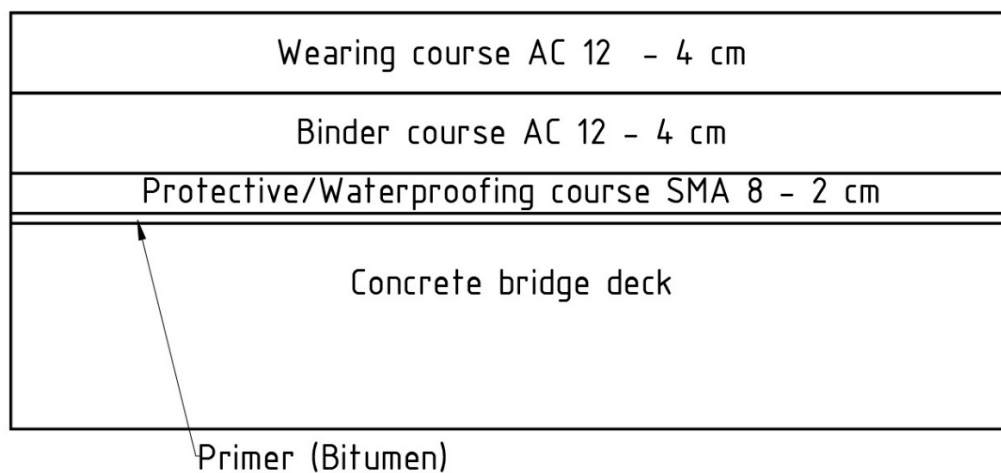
Structure of pavement on the Cłowy Bridge in Szczecin (constructed in 1998).
